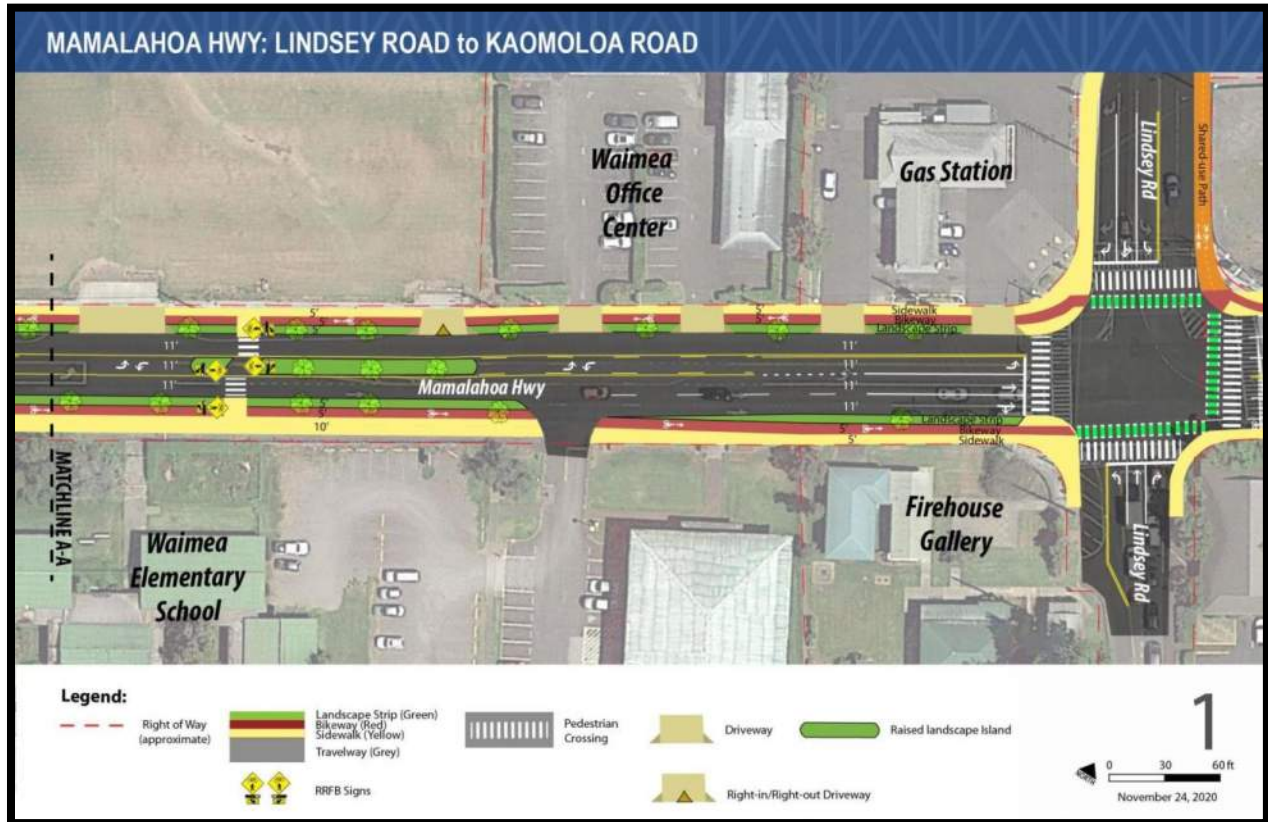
Conceptual Plan for Improvements to Mamalahoa Highway Between Kaomoloa Road and Lindsey Road (2 of 3)
